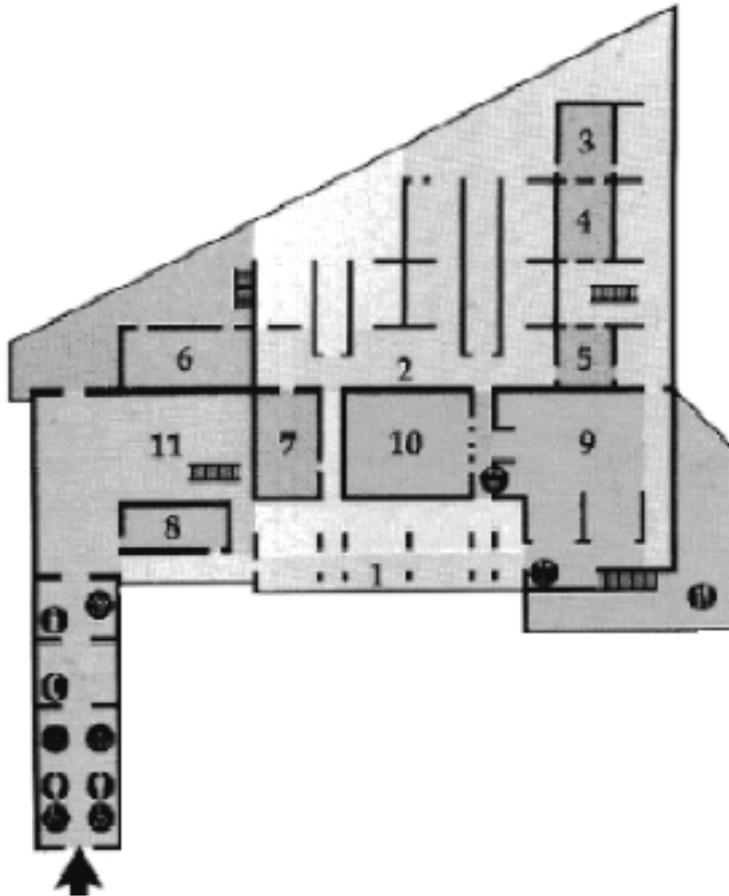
Ground floor plan of the Burrell Collection, Glasgow (Marks et al 1983)
